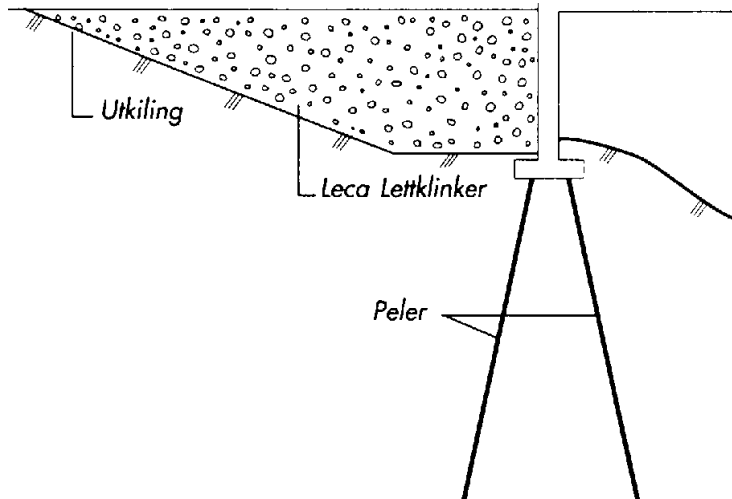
LWA to reduce weight and earth pressure in bridge foundations
